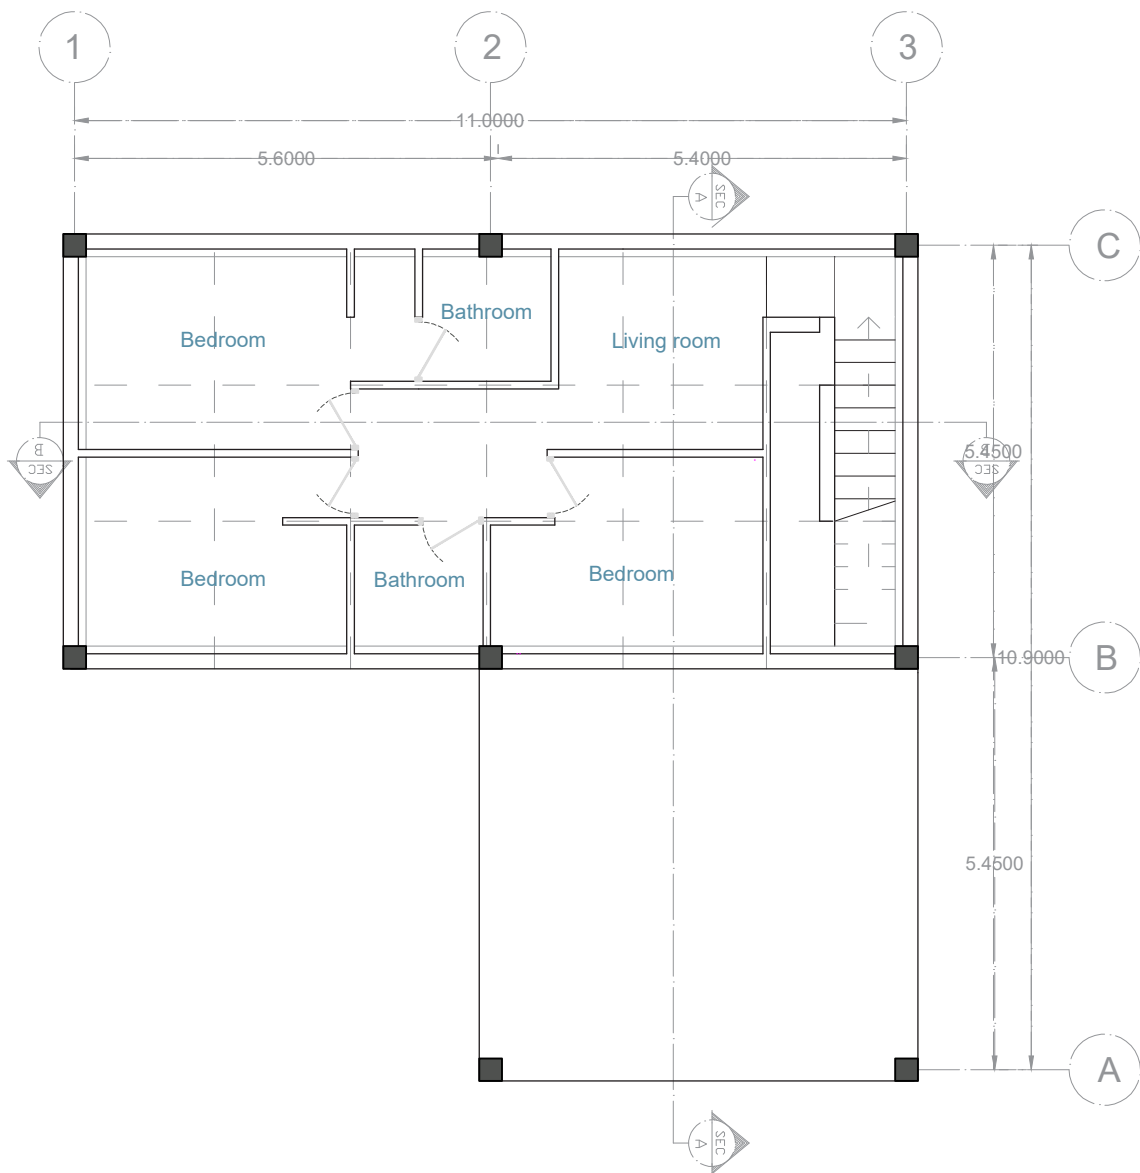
plan unit 120 m² SC 1.100 (source: author)
